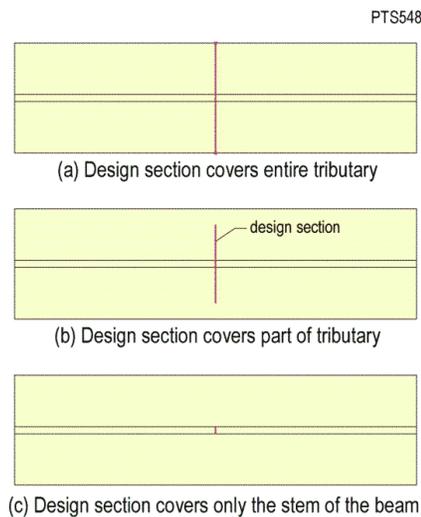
Plan of Flanged Beam Showing Different Design Section Widths
